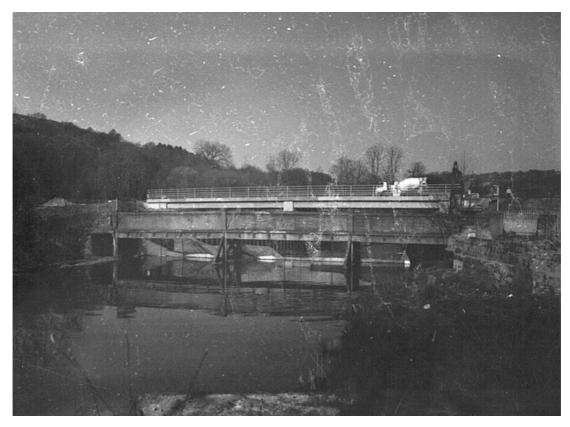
South-east-facing elevation of Sterne Bridge (MF SB01_03)
